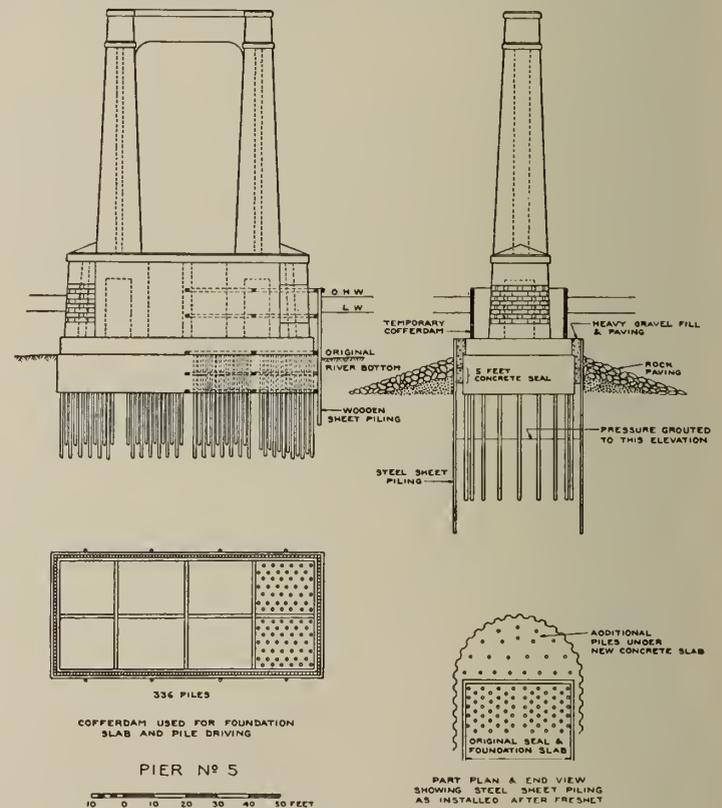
Pier No. 5, Showing Plan of Restoration.
